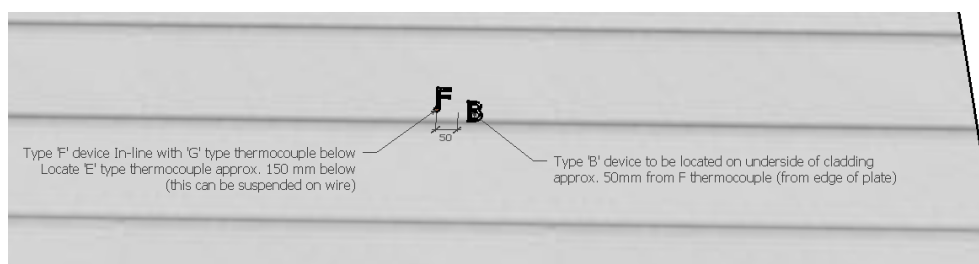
Experiment #2 Roof thermocouple locations, detail view
